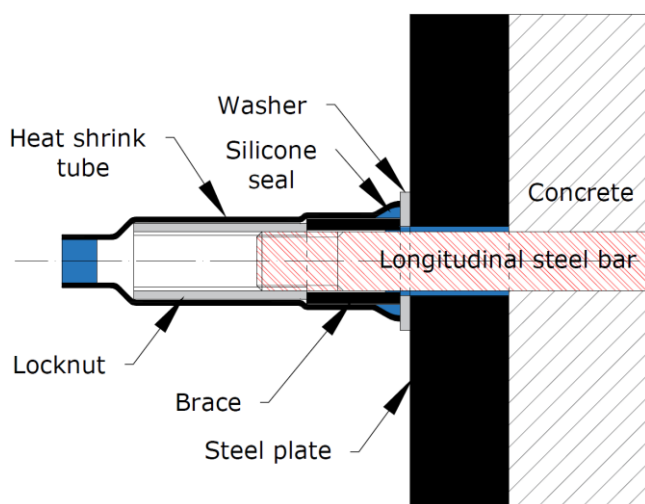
Longitudinal anchoring of uniaxially ($R[1.1\%]$) and triaxially ($R[1.1\%]+S[0.7\%]$) reinforced specimens.
